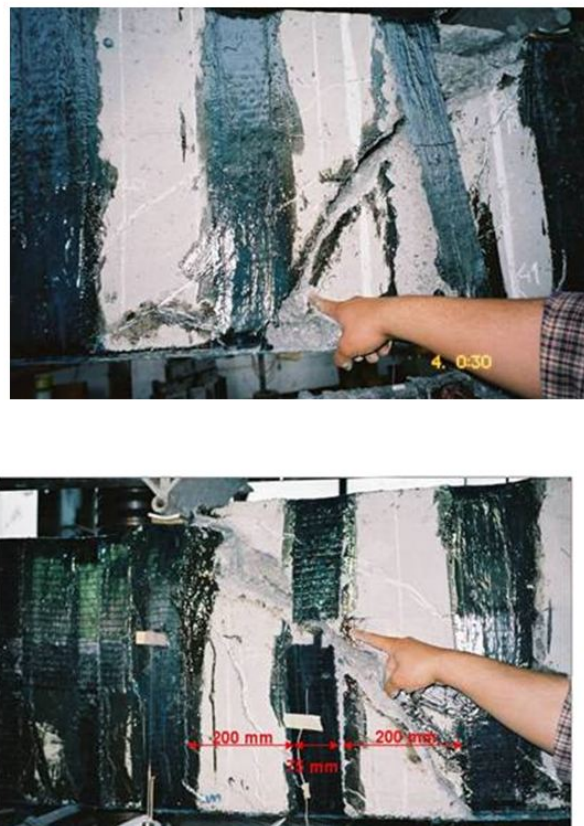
Shear failure accompanied by the rupture of the CFRP stirrups as well as of crushing of the concrete compressive zone at the shear transfer area neighboring the point of loading.
